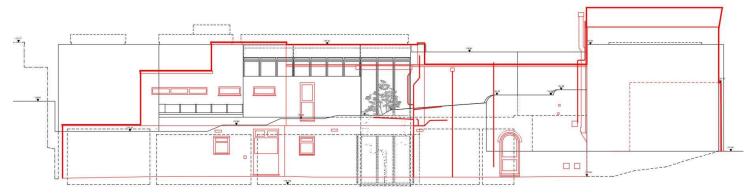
Existing Rear Elevation in red, proposed new elevation in black
